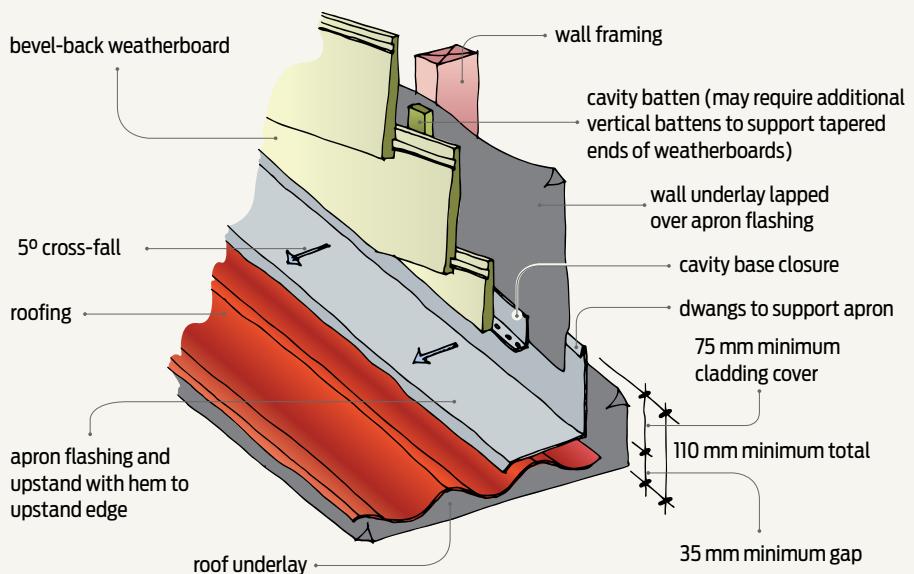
Apron flashing at roof/wall junction – parallel flashing.
